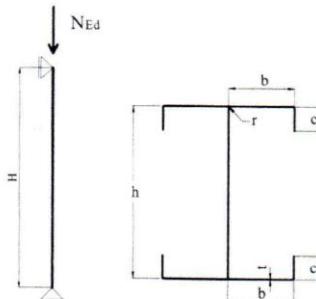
Overall dimensions of internal wall stud and cross section
